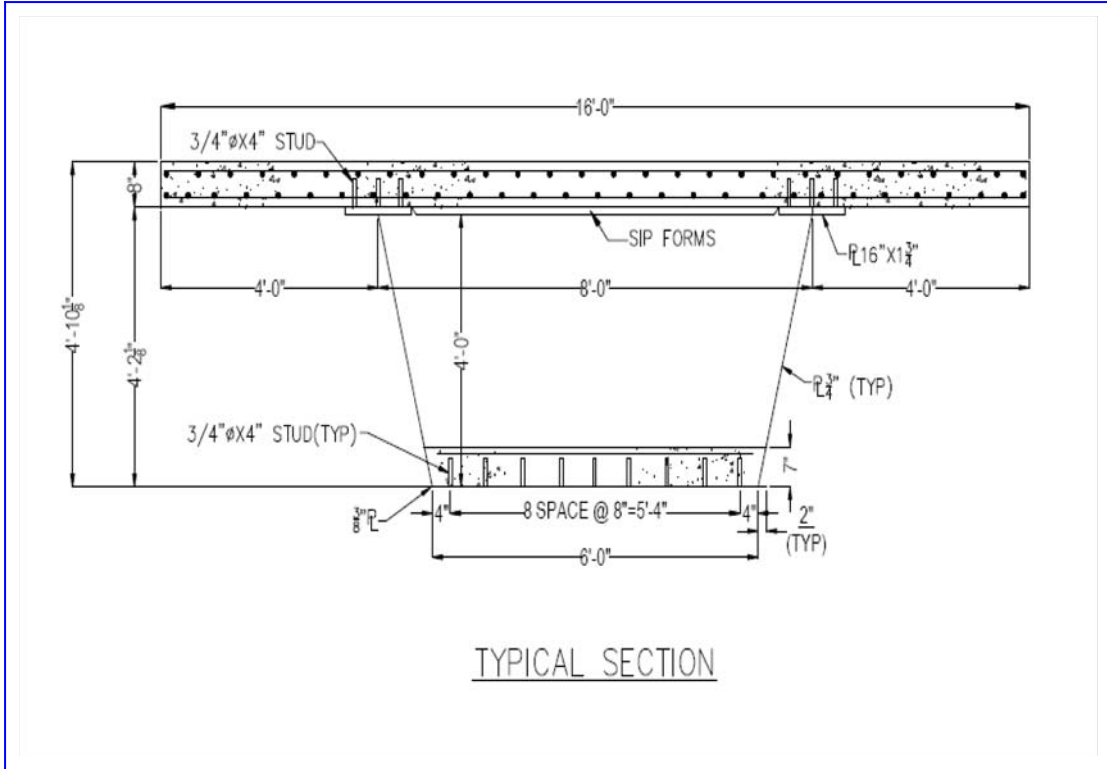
Typical Cross-Section of Double Composite Box Girder
